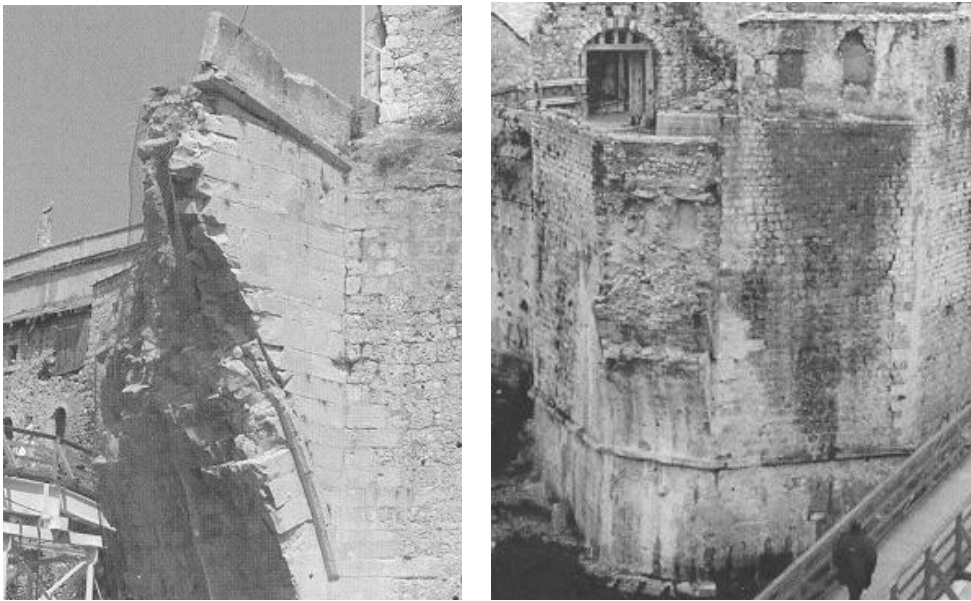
Destroyed Old Bridge – right and left bank (Žderić, 2007)
